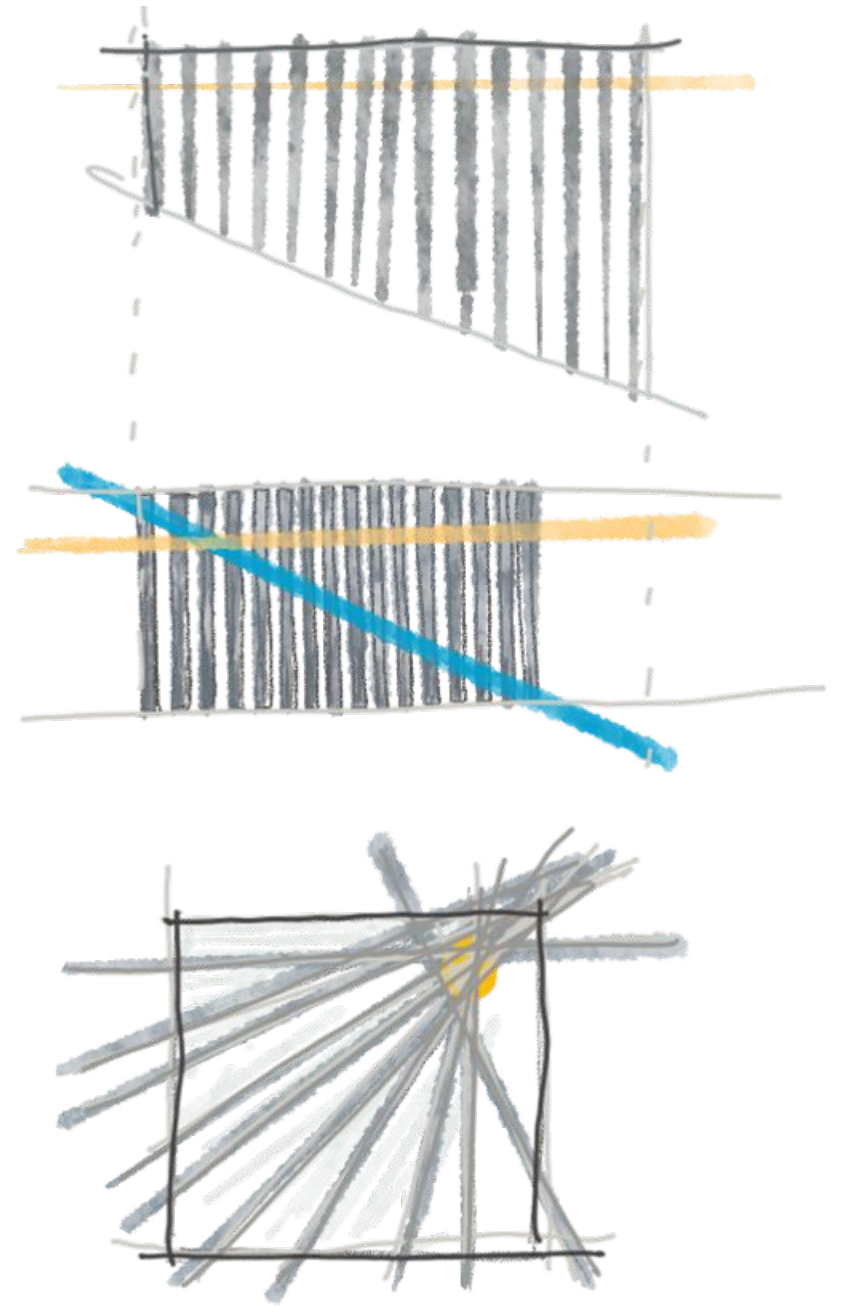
Touchstone - Concept plan, section and elevation (Author, 2022)
